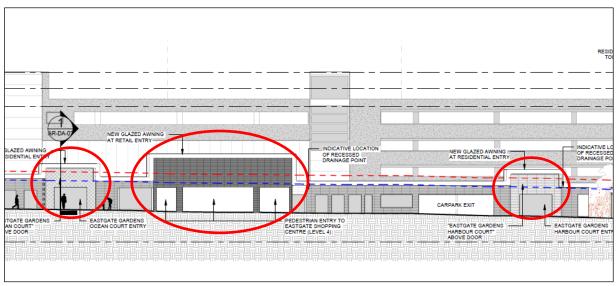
Extract of submitted architectural plans – Spring Street elevation
